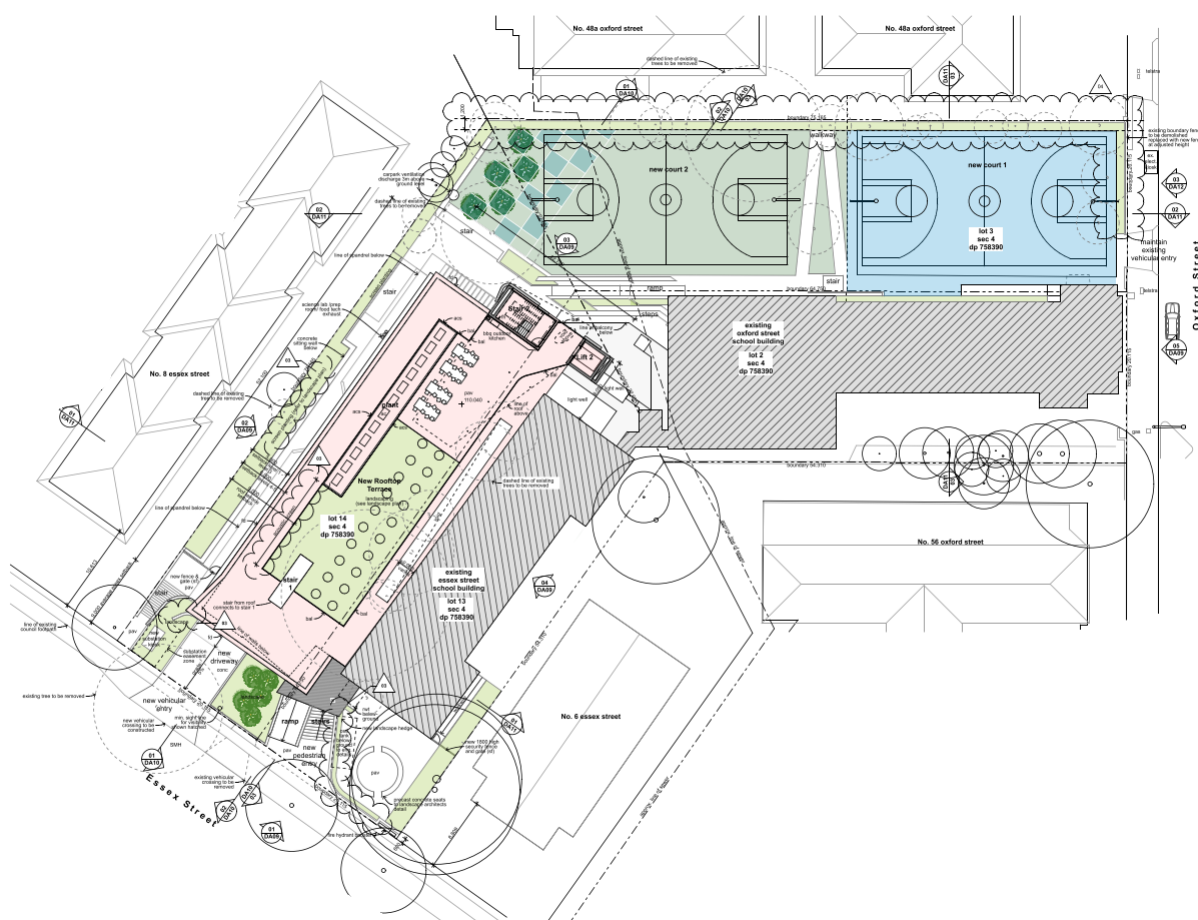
Site plan showing the location of the proposed new works (highlighted in colour) within the Arden Anglican School including the existing school buildings (cross-hatched). *Source: Stanton Dahl Architects
